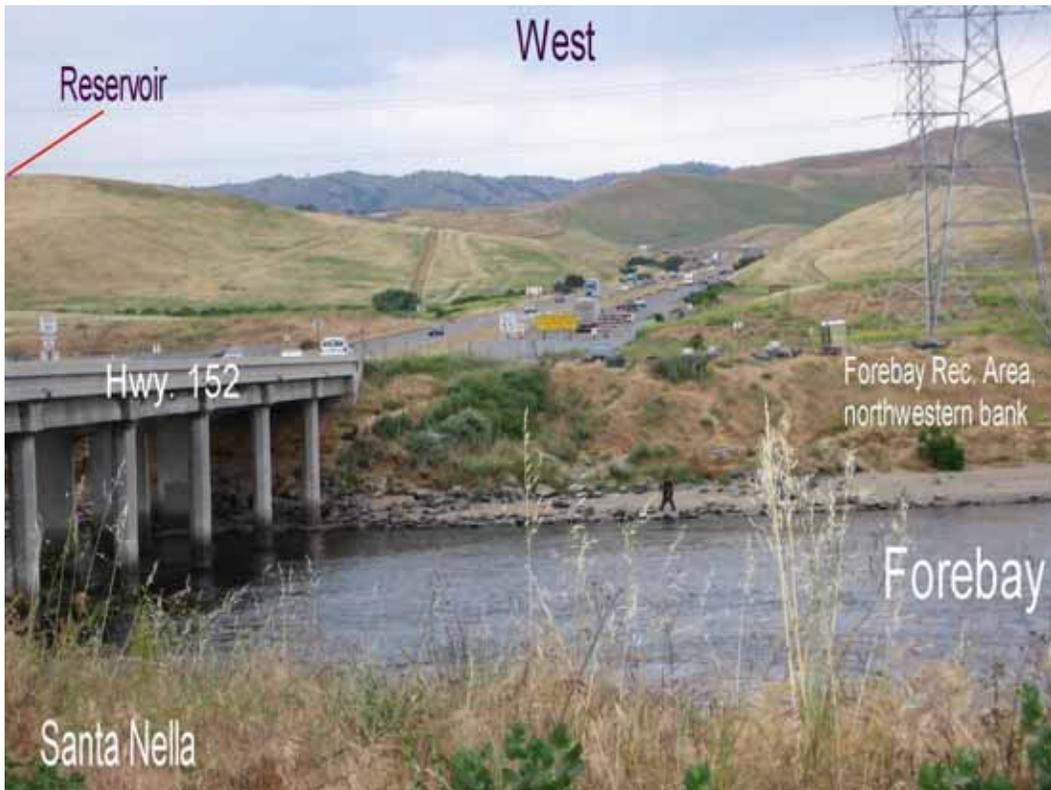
Undercrossing (under label "Hwy. 152") of Highway 152 bridge at O'Neil Forebay, Santa Nella, California.
